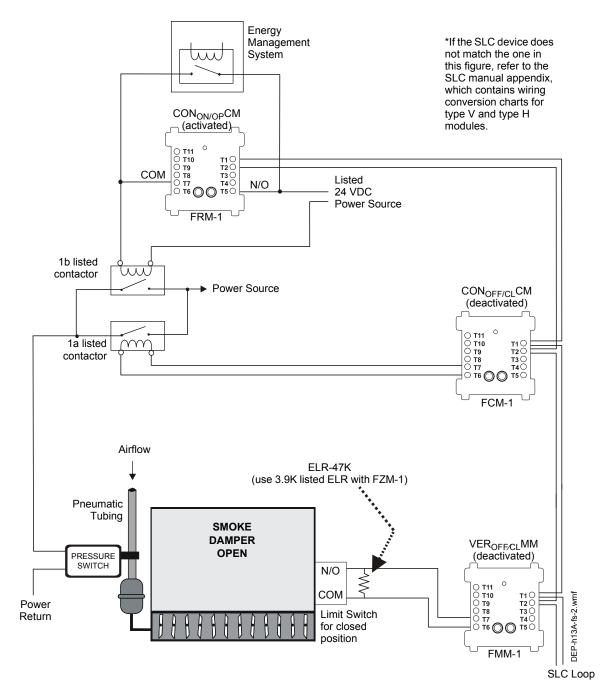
EP Damper Control - HVAC Switch Group Type 13
